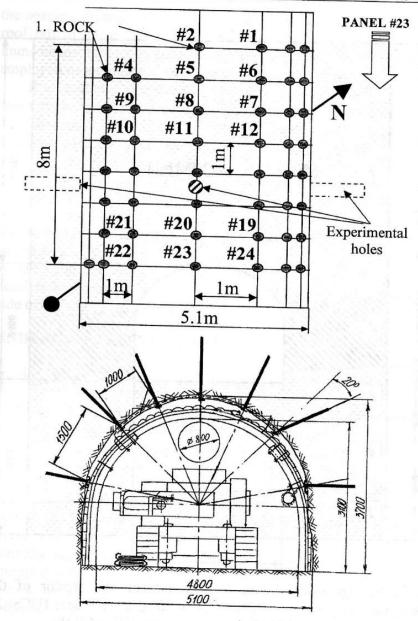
Plan view (upper) and cross-section view (lower) of the instrumented sector of the underground roadway.
